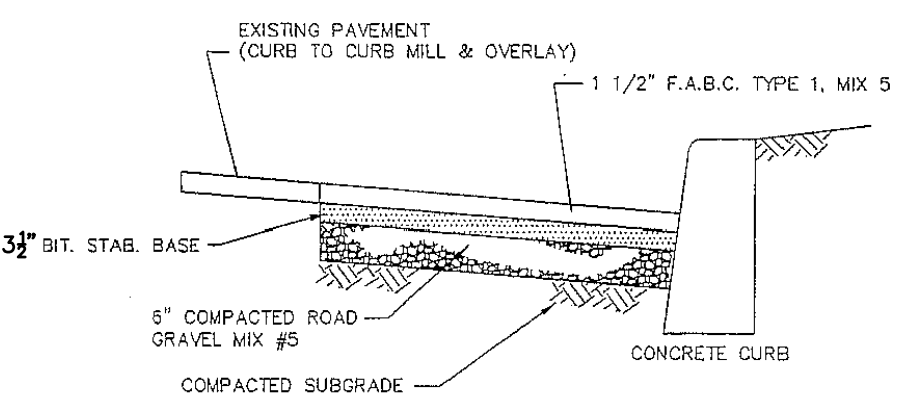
DETAIL: TYPICAL SECTION - TYPICAL DRIVEWAY
